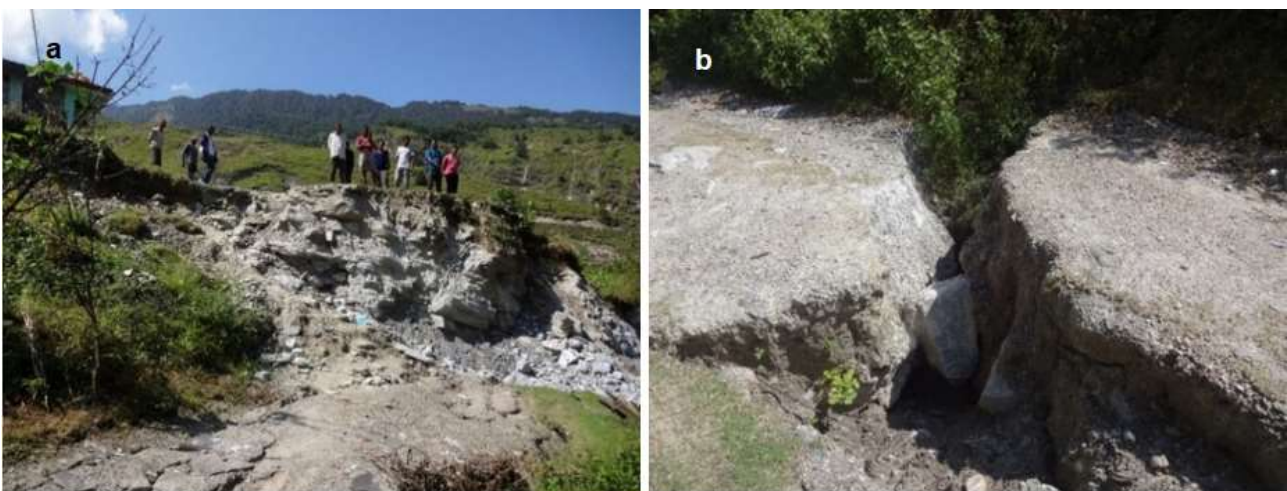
Slope instability in the area around Josha Village; (a) ground fissures at Ropad Tok and (b) cracks trending N-S across newly under construction road between the Ropad Tok and Sirwakhan Tok area
